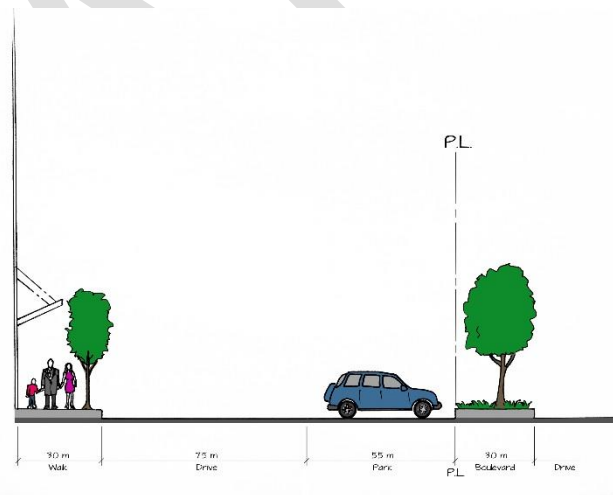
G.F2: Chuka Boulevard Interface Cross Section
